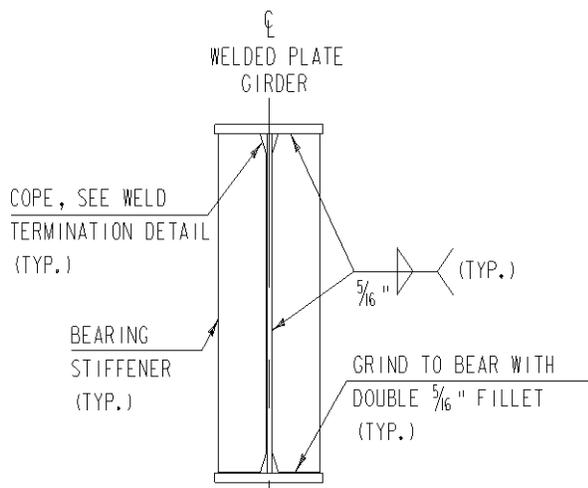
3 Abutment bearing stiffeners for welded plate girders
